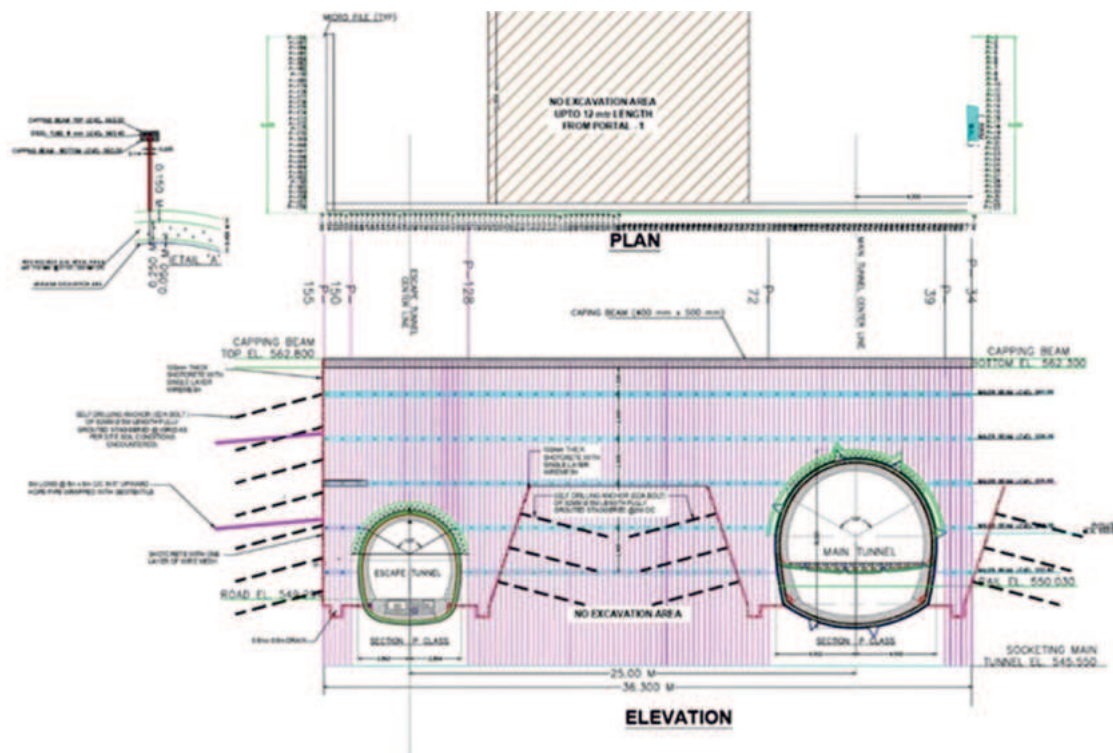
Plan and elevation of escape and main T11 at portal 1
